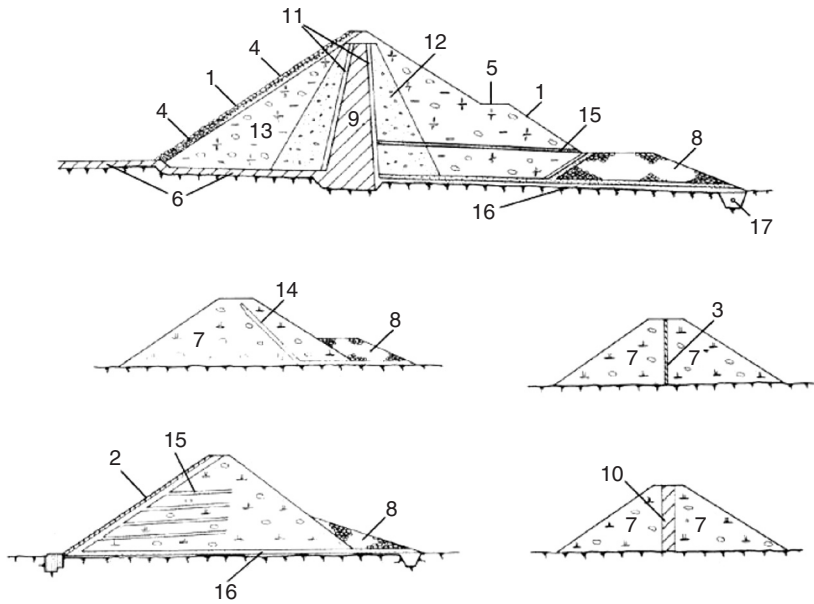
Types of embankment dams: (1) slope; (2) facing; (3) diaphragm; (4) slope protection; (5) berm; (6) upstream blanket; (7) shoulder or shell; (8) toe weight; (9) core; (10) core wall; (11) filter; (12) transition zone; (13) pervious zone; (14) chimney drain; (15) drainage layers; (16) blanket drain; (17) toe drain (ICOLD).
